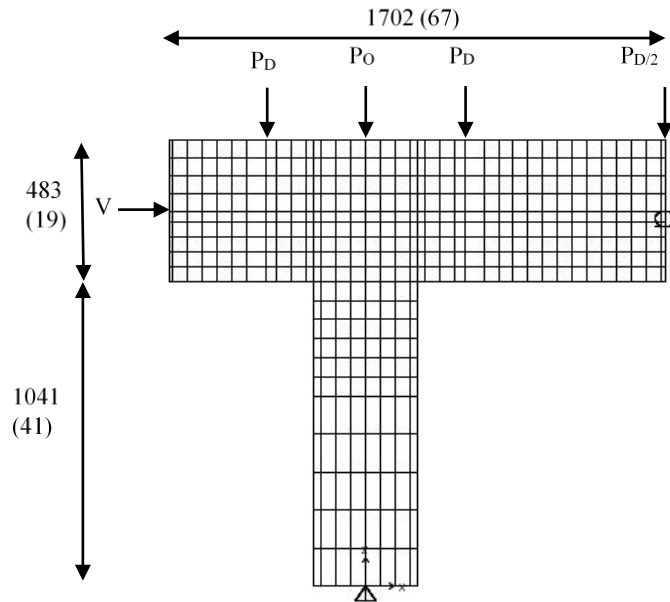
Analytical model details of the column-cap beam connection [units are mm (in)]
